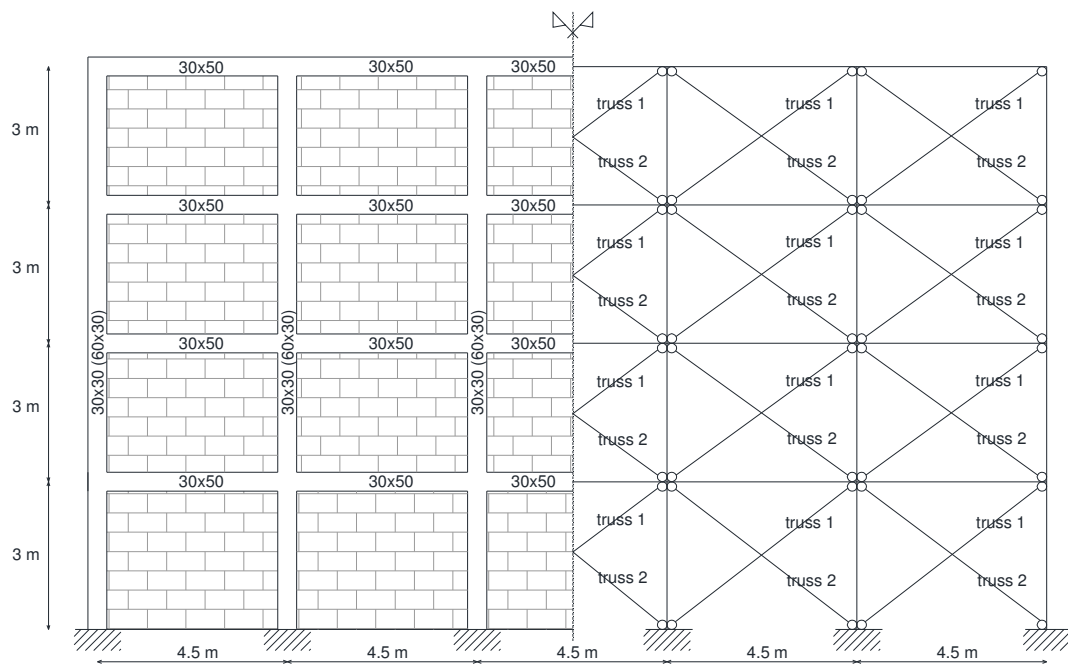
Four storey case-study infilled RC frame; member dimensions for GLD (and SLD) are provided.
